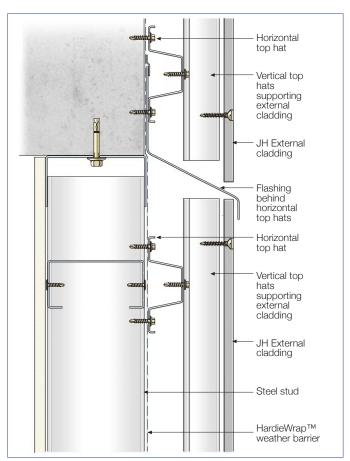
EXTERNAL STEEL STUD WALL HEAD
